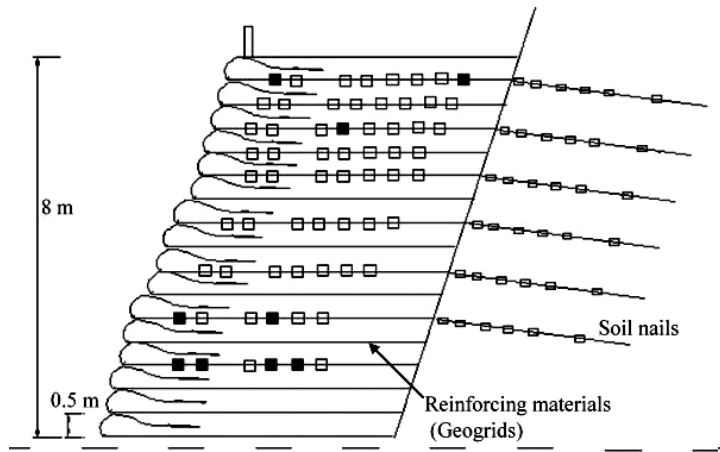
Typical design cross-section and instrumentation of the hybrid reinforced earth embankment (Note: strain gages are marked with hollow square, and the strain gages with dark square were destroyed after the construction of the embankment)
